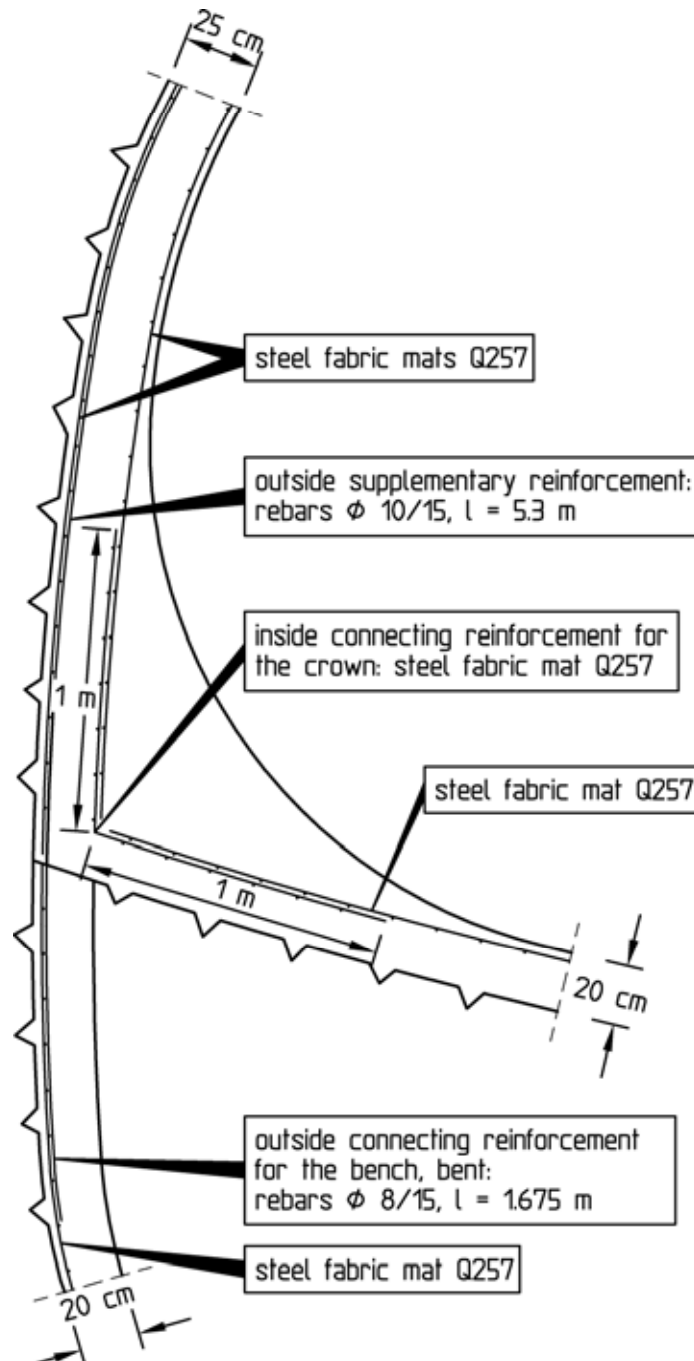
Design and reinforcement of the shotcrete membrane in the area of the crown's foot
